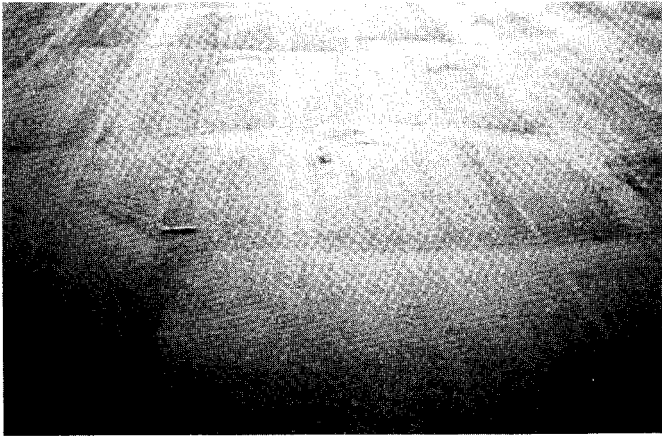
Low-Severity Block Cracking, Filled Cracks
